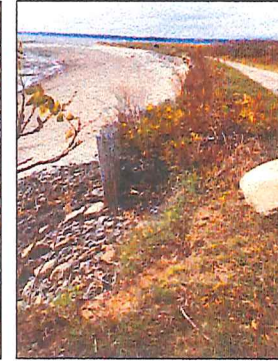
Erosion at bank along road and behind Bulkhead Section "C"
